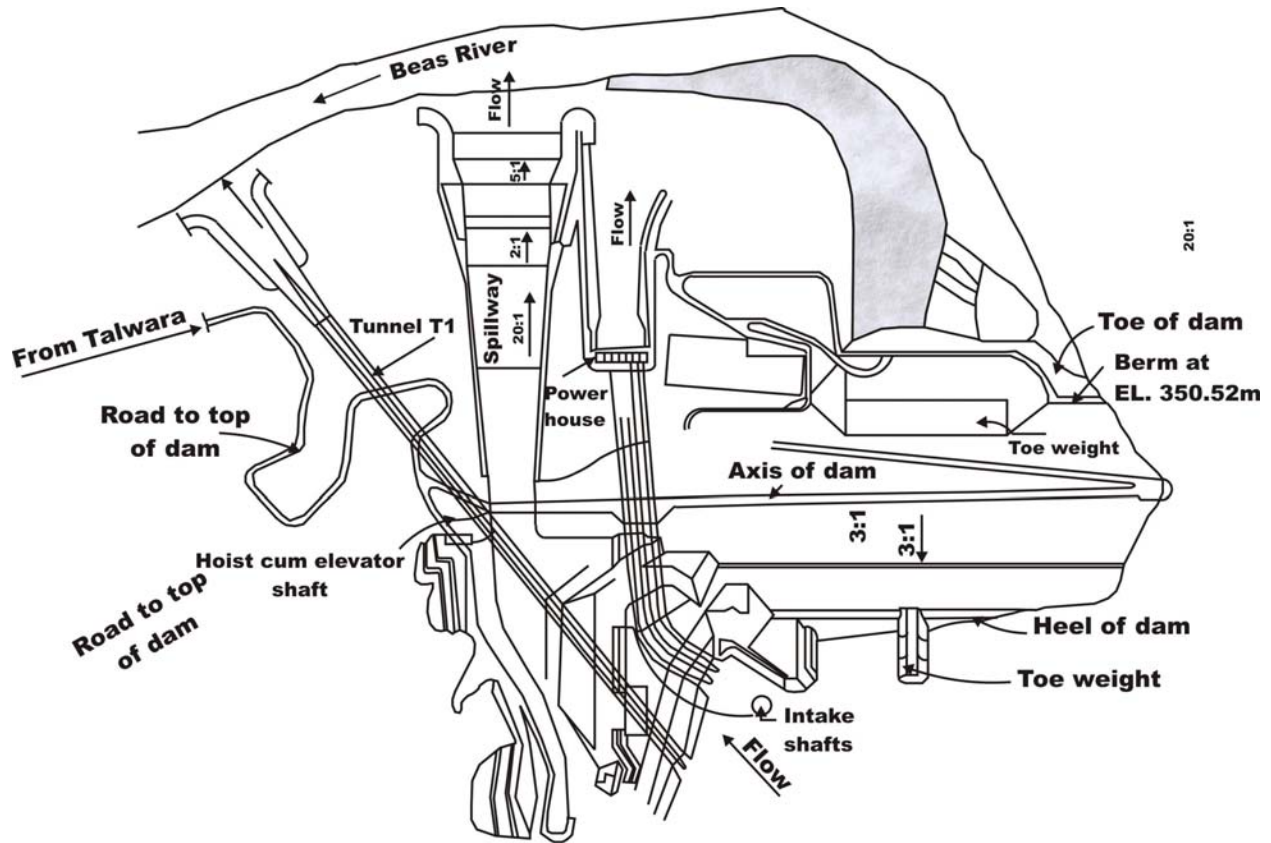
GENERAL LAYOUT OF PONG DAM ON RIVER BEAS
